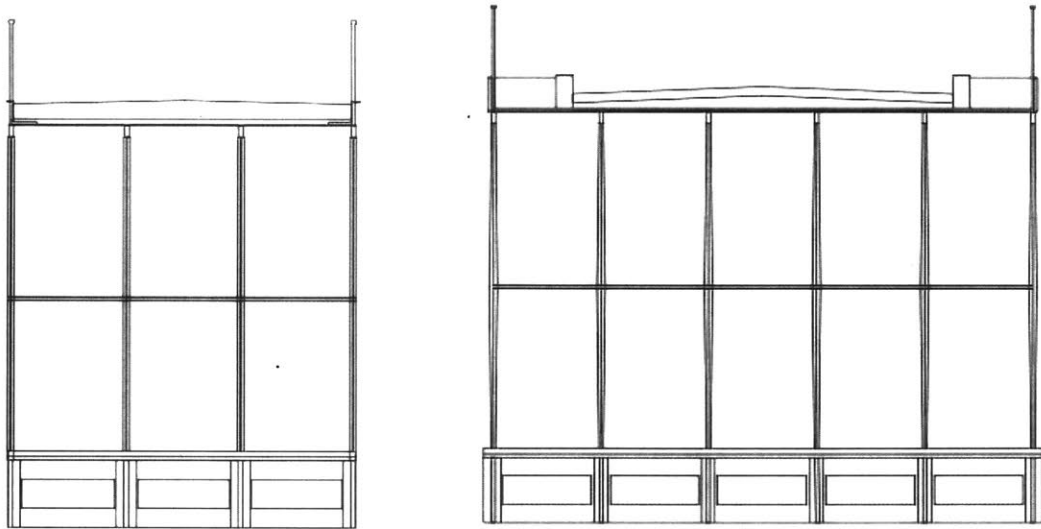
Typical cross-section of Bonar Bridge (left) and Mythe Bridge (right) (Lane 2017)
